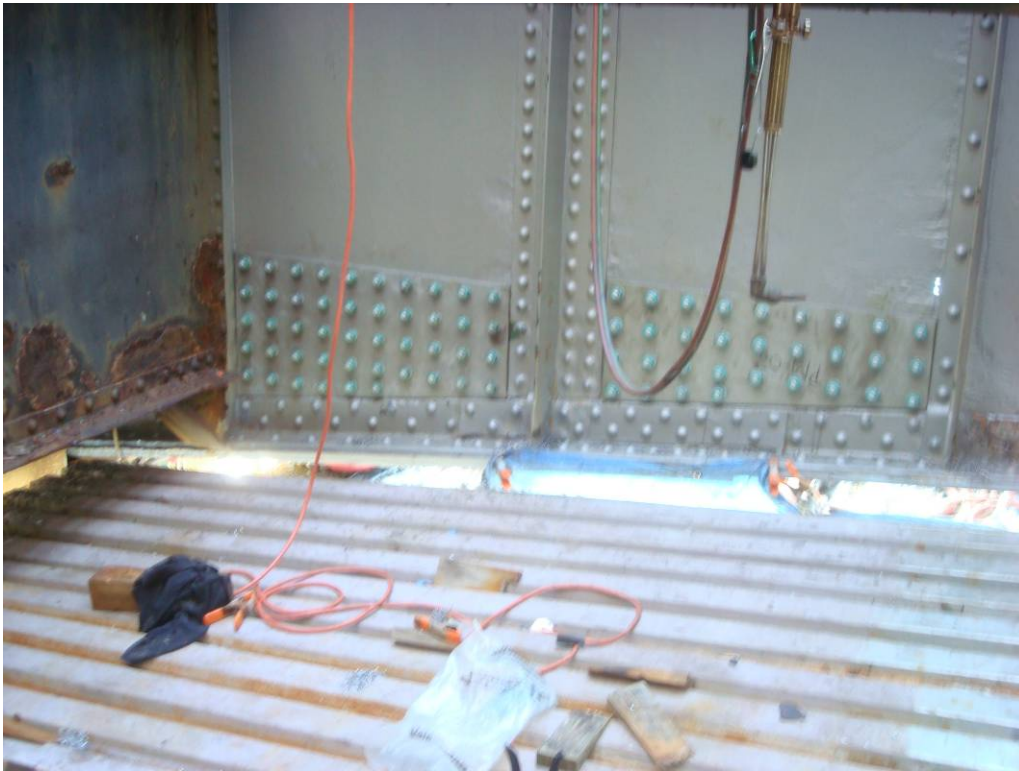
General configuration of the East face of the Southwest girder repairs between FB4 and FB3 installed. H.S. Bolts still need to be tightened with an air impact wrench.
